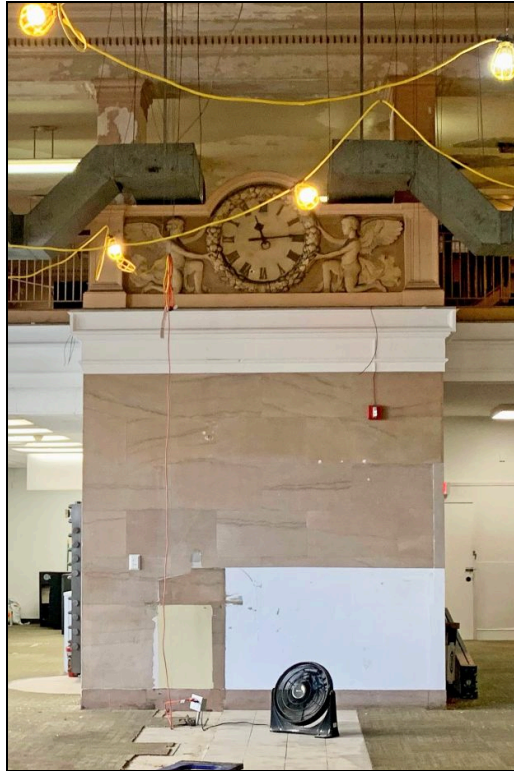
South side of the banking hall, below the mezzanine, looking east.
